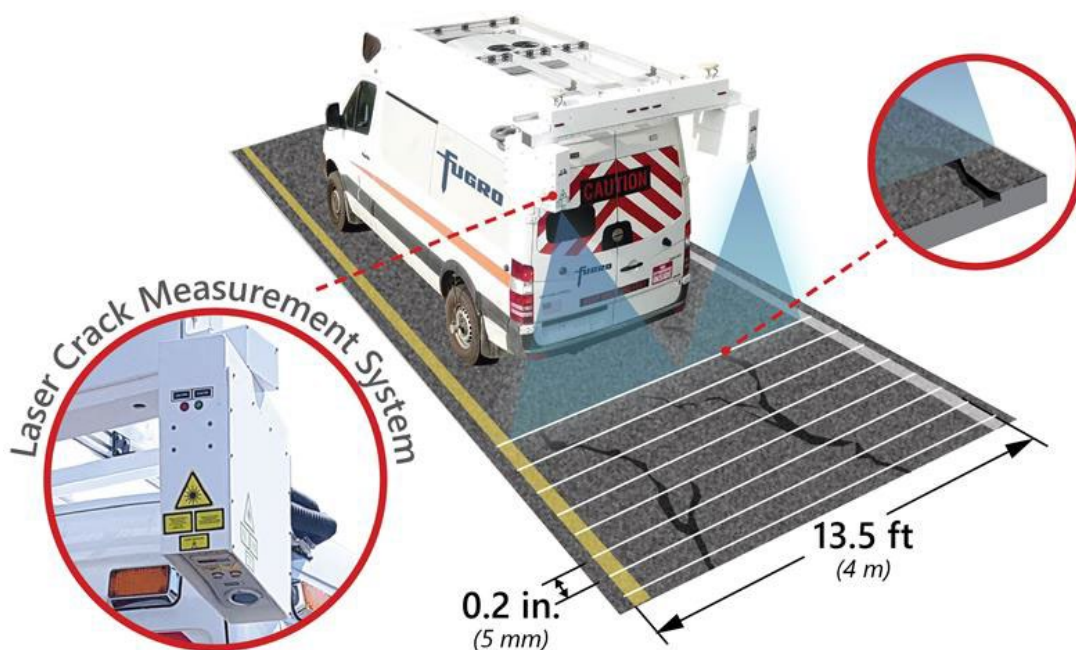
Pave3D system. Our system utilizes second generation Laser Crack Measurement System (LCMS2) sensors to collect detailed pavement image and crack depths, widths, and lengths.
